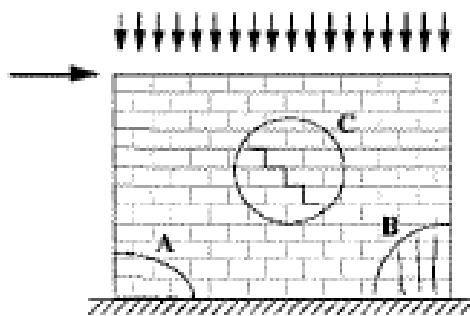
Various in-plane failure modes are observable in a masonry wall, as per Lang (2002).
